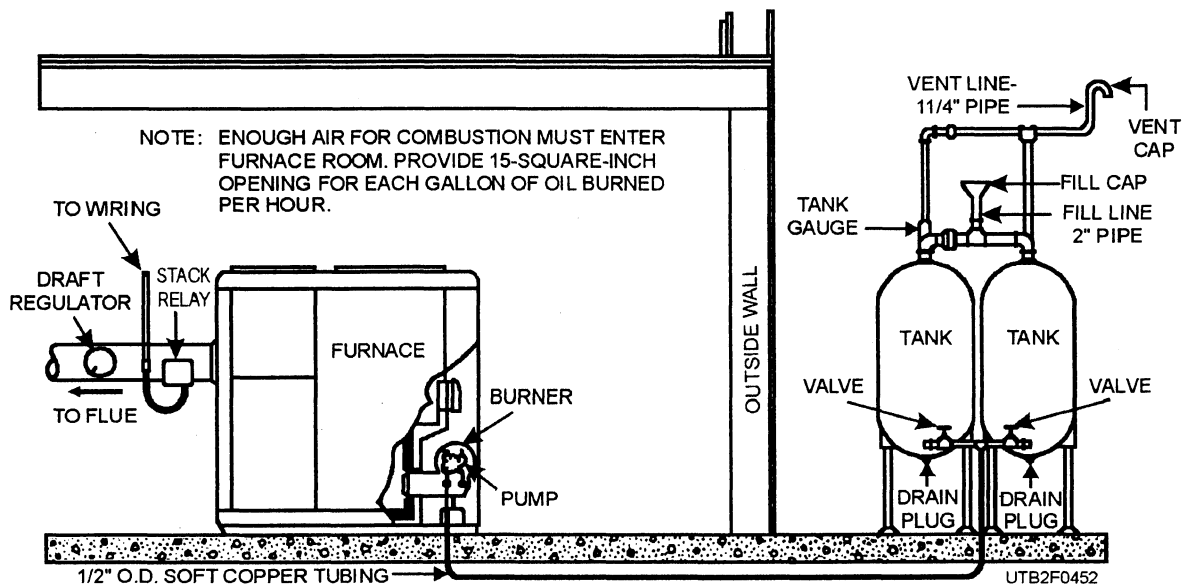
Diagram of piping for inside or outside elevated tank installations.
